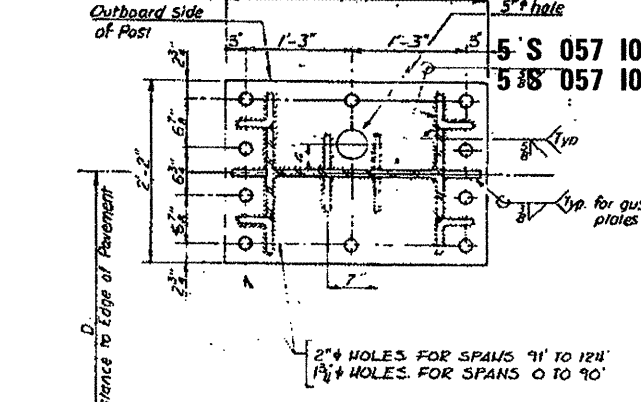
DETAILS FOR STRUCTURES 1 THRU 7 SHOWN; 8 AND 9 ARE SIMILAR EXCEPT AS NOTED.
